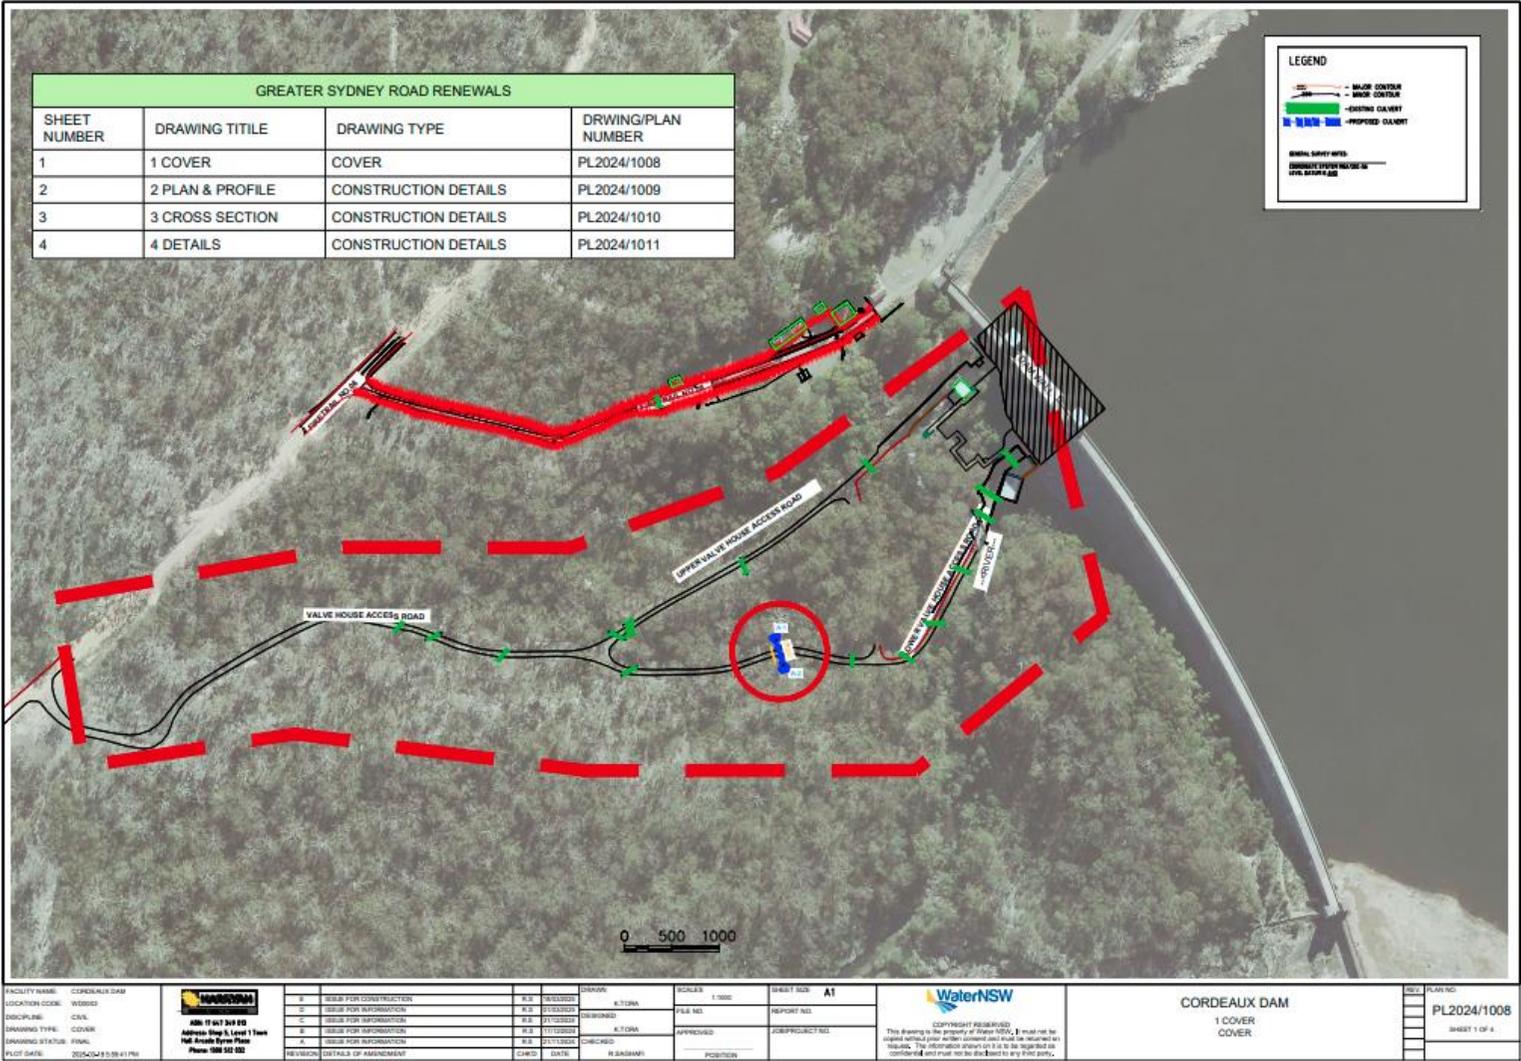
Location of existing (green) and proposed (blue) culverts (Source: Cordeaux Dam Construction Drawings, Water NSW)
